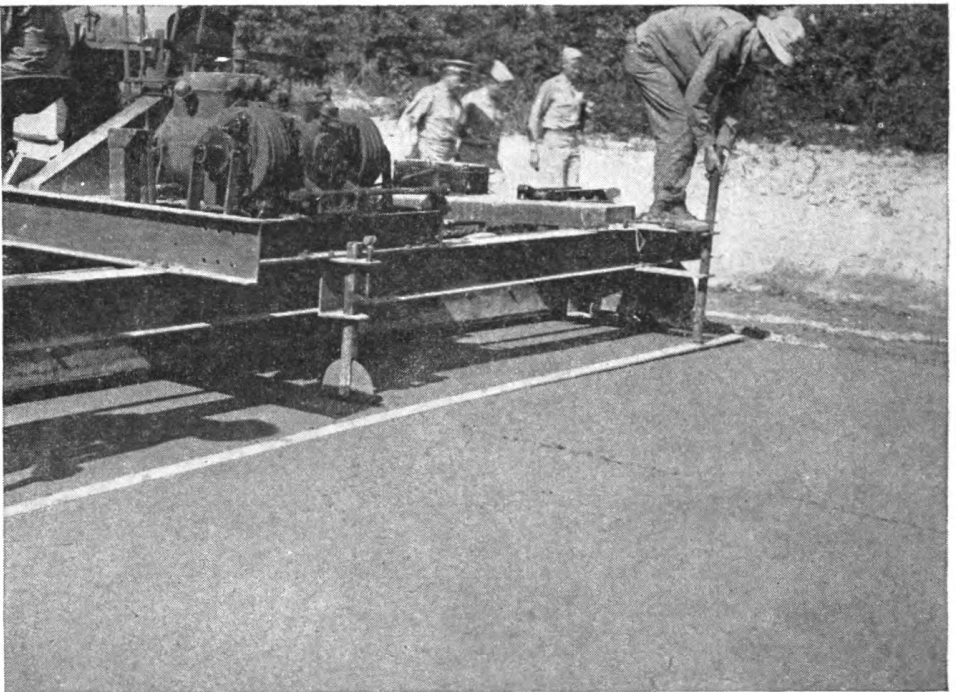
Finishing machine. Note wheel cutting longitudinal dummy groove joint.
